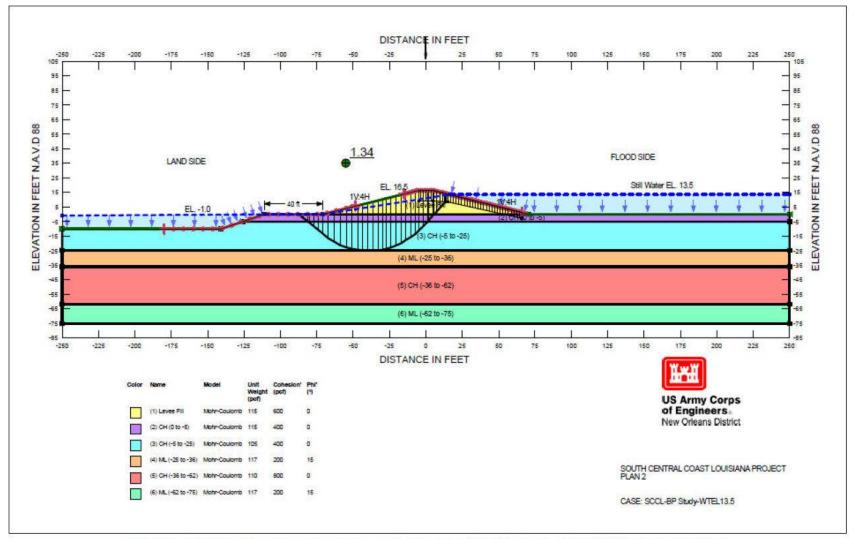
Measure 2 Levees - Slope Stability Analysis for Still Water Elevation
